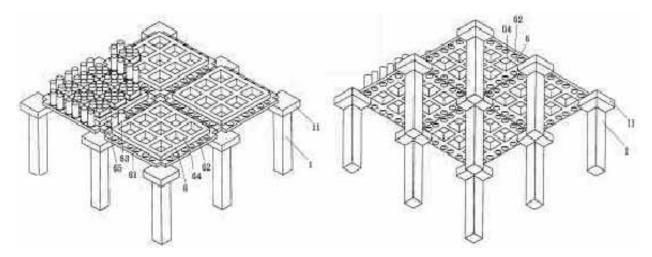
Semi-precast Waffle Slabs seating on precast columns with four-side bracket are divide into segments base on those grid lines
